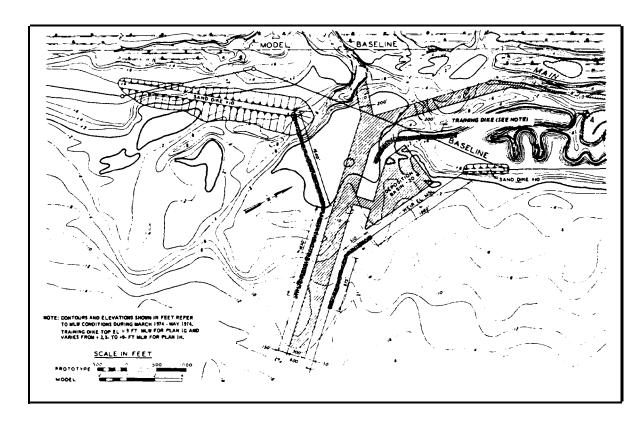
Optimum improvement plan, Murrells Inlet, South Carolina.
